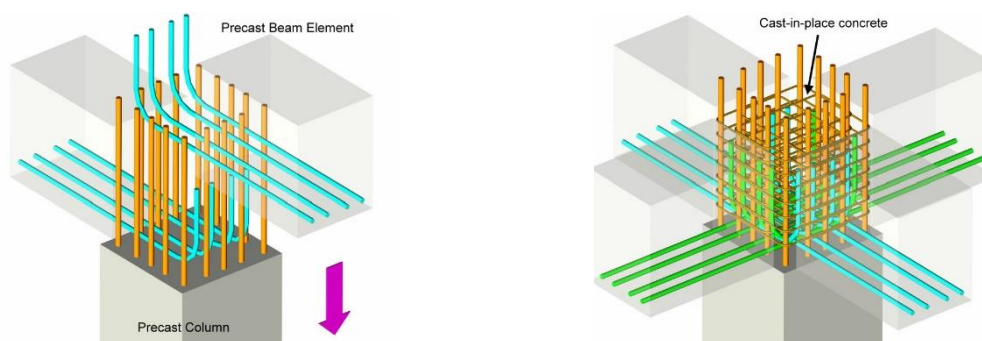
Conventional arrangement for connecting precast beams at a cast-in-place joint.
